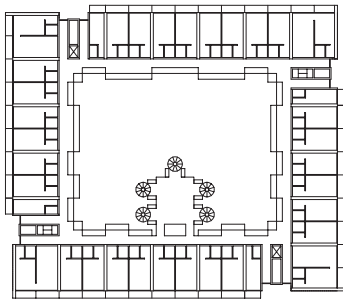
Typical guestroom floor plan of the Hyatt Regency Atlanta.
